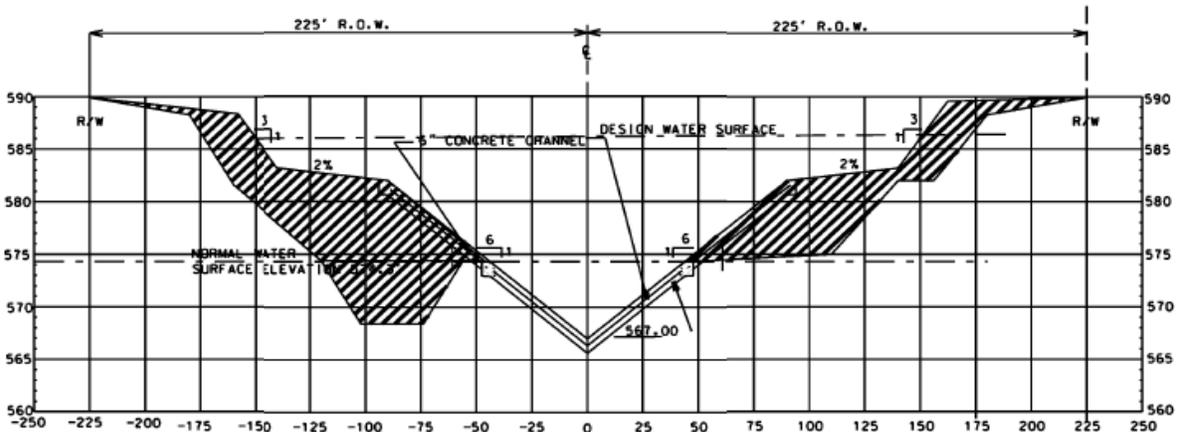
Cross Section Showing Bank Excavation and Side-Stream Wetland in North Bank.
